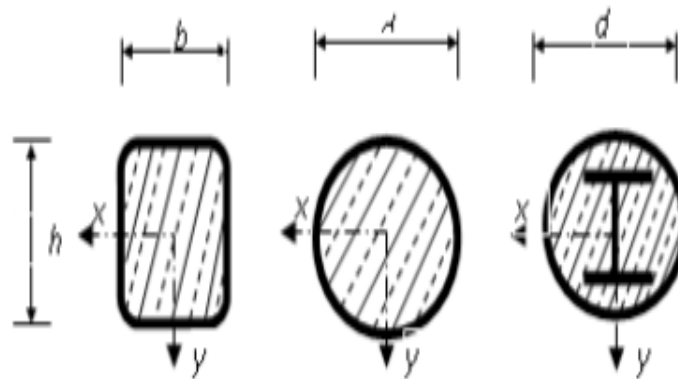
Typical Cross Sections of Concrete Filled Tubular Sections
